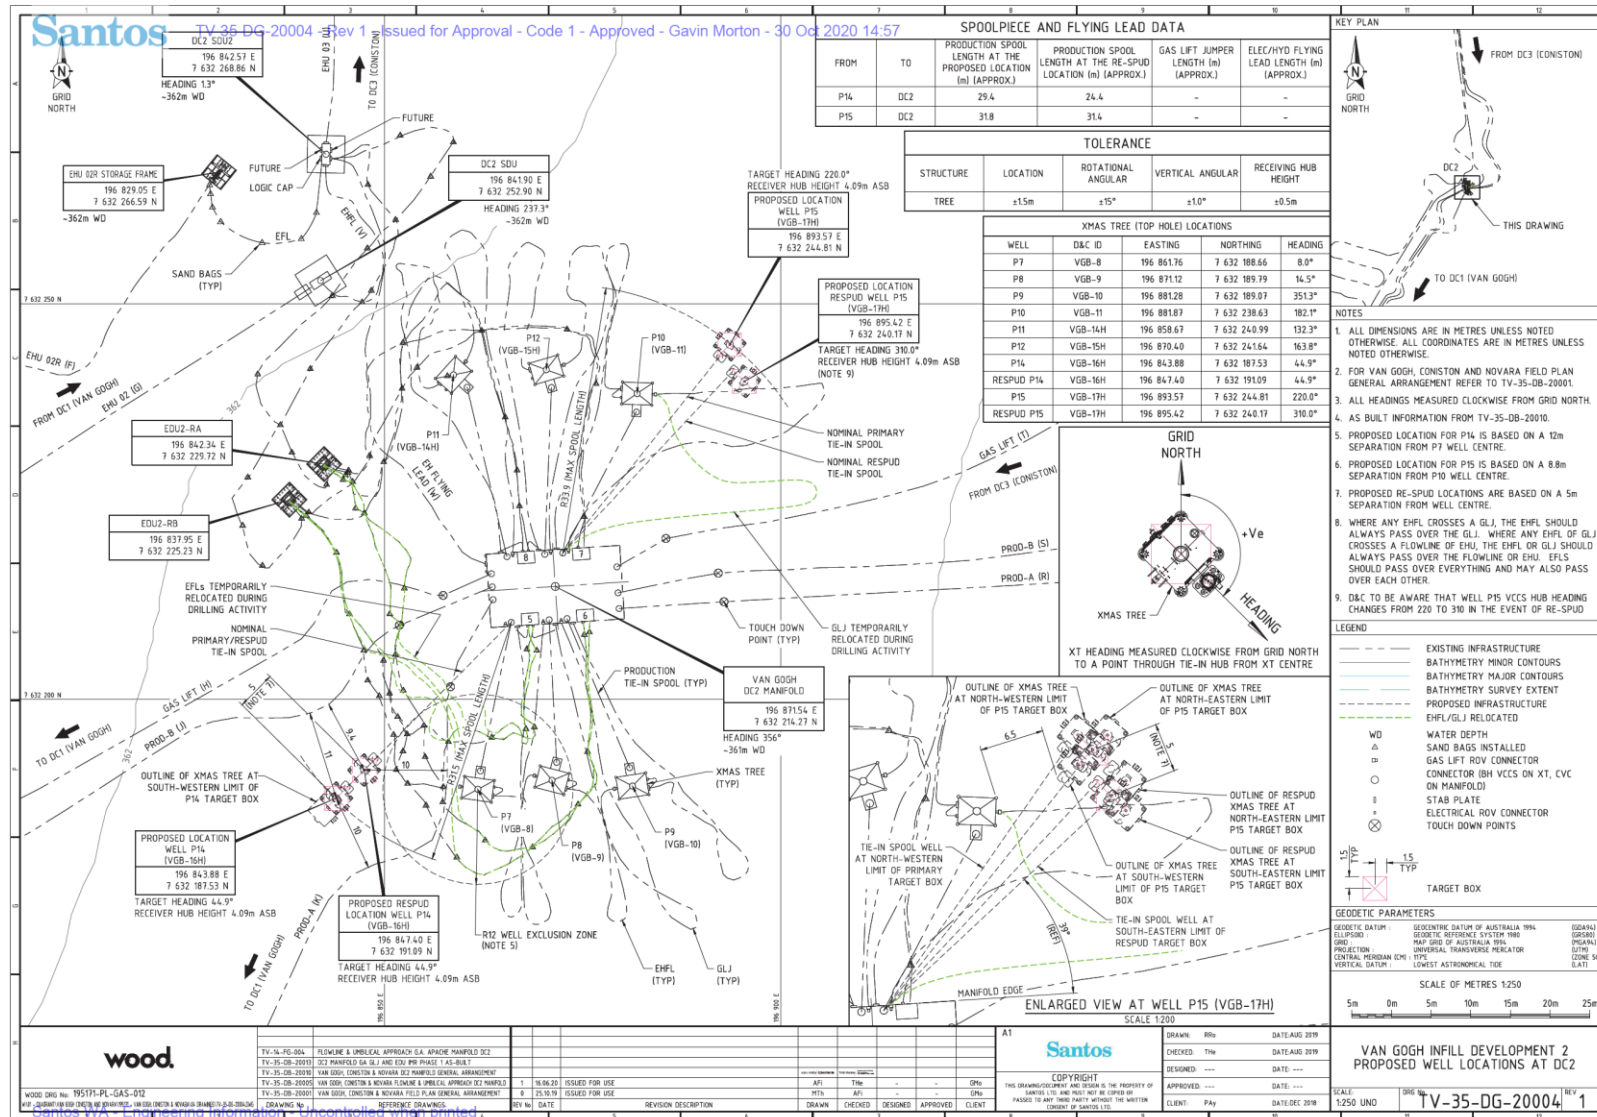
New infrastructure layout of the VGID2 installation DC2 manifold layout
